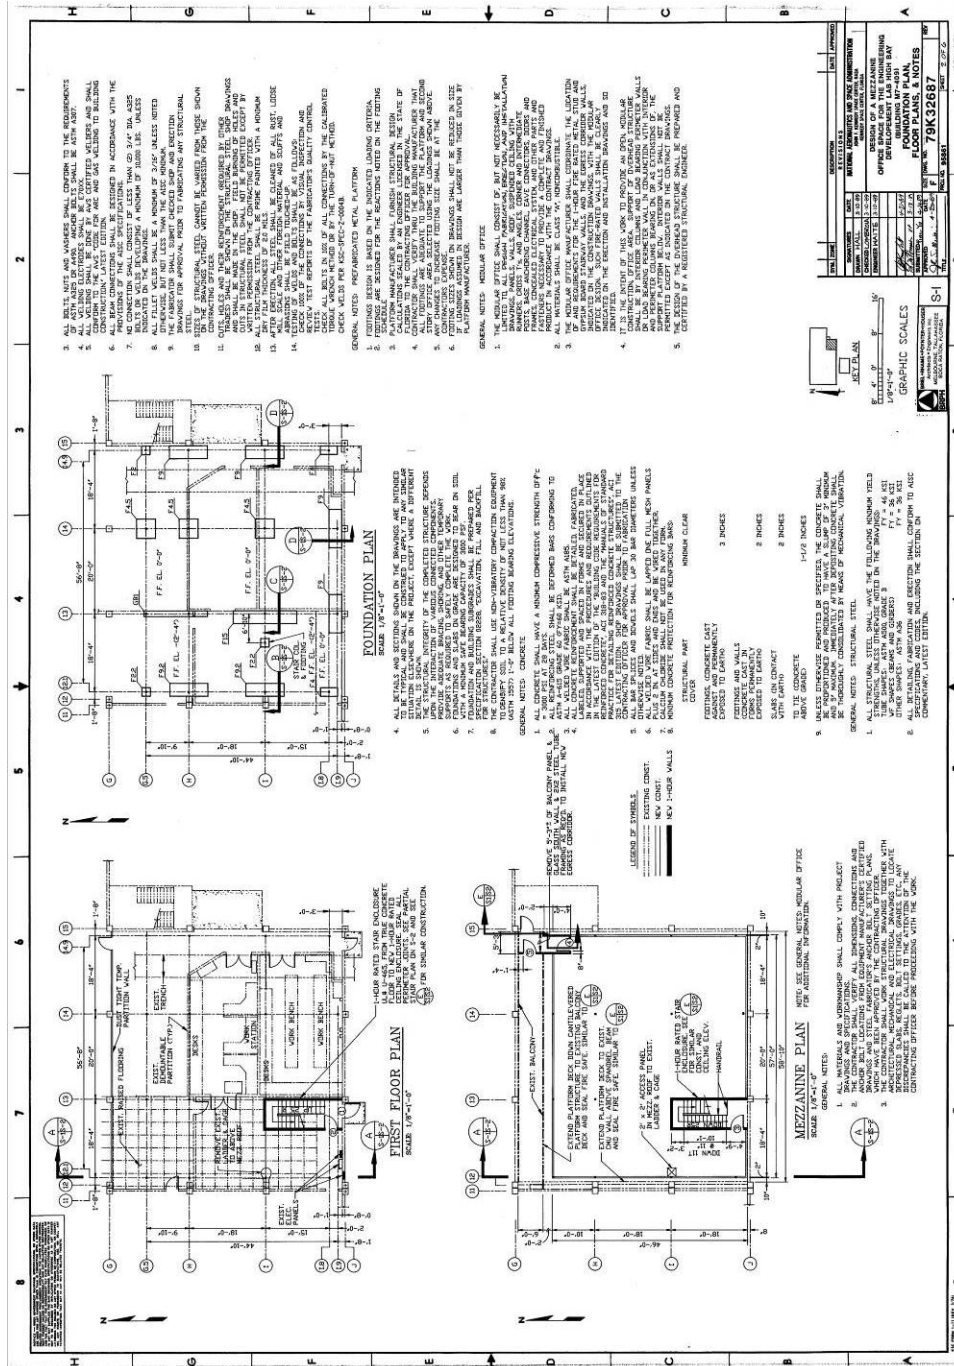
NASA KSC, Building M7-409-Mezzanine Office Space, Foundation Plan, Floor Plans and Notes, April 1989, Sheet 2 of 6.
